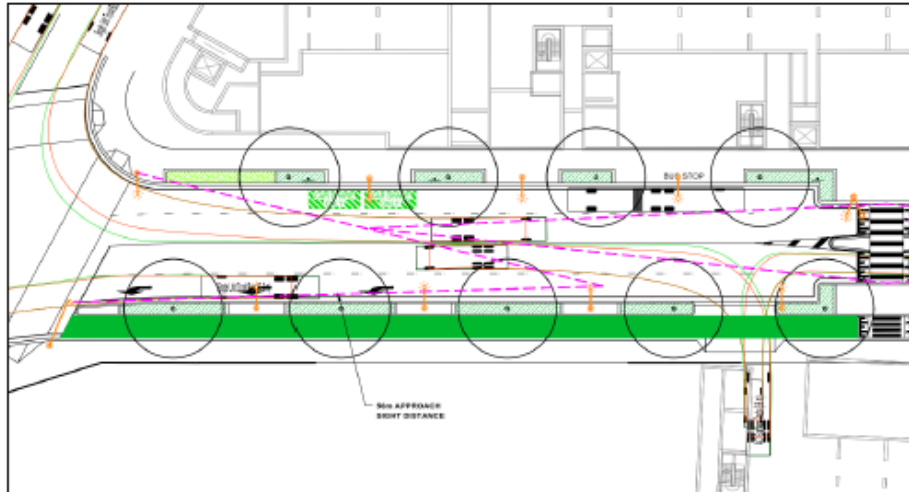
SSD assessment for O'Riordan Street – Connector Road intersection (west)
